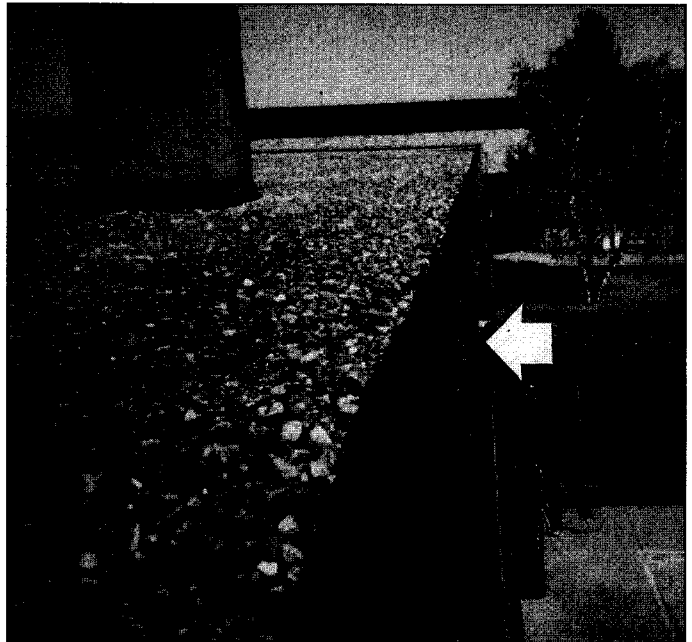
Roof S7: Membrane contraction caused the top of this weak metal parapet to move to the left. The parapet rested on the field sheet and the sheet was attached with roofing nails spaced at 18 in. and 18 in. (455 and 455 mm). It may have also had other securement. Water can now enter the top of the parapet (see arrow).
